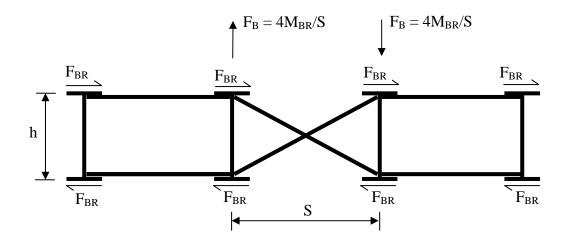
3 Diagram of Brace Forces Acting on Girders
